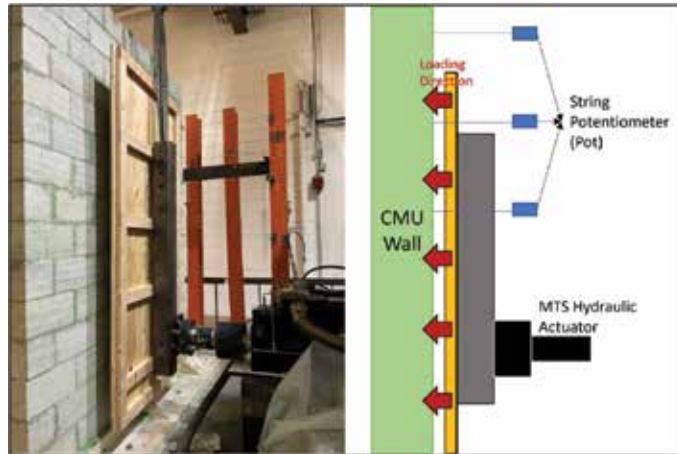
The CMU wall test setup with a steel beam and a wood box used to apply the load
